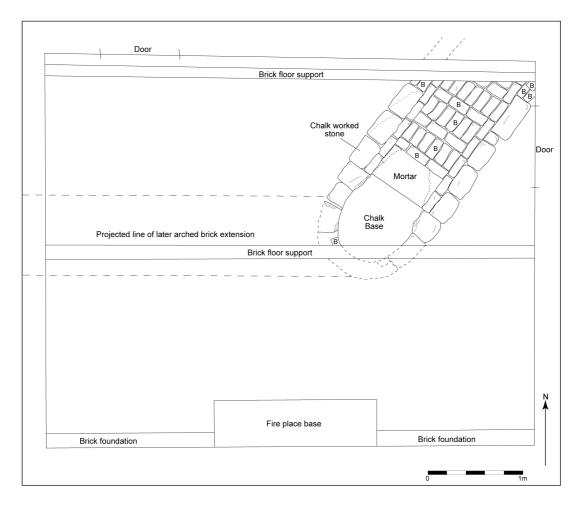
Plan showing masonry passage and chamber revealed in No. 19 St Thomas Street
